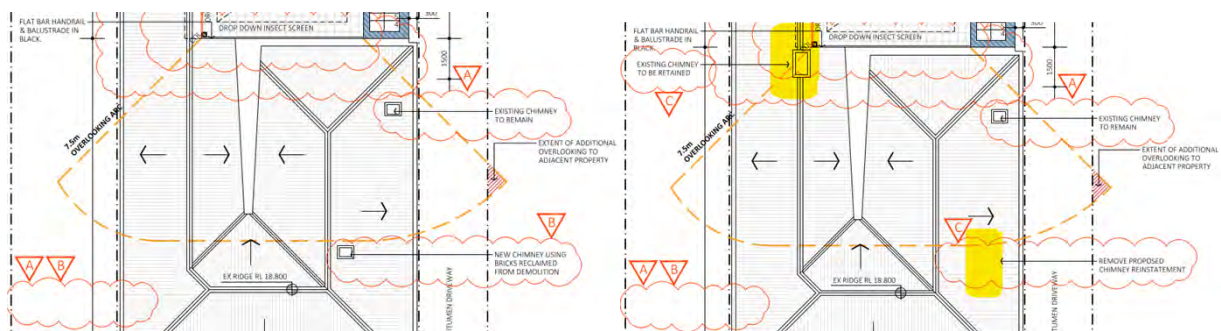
previous plans on left, amended plans on right that show retention of all chimneys and deletion of proposed replacement chimney (highlighted)
